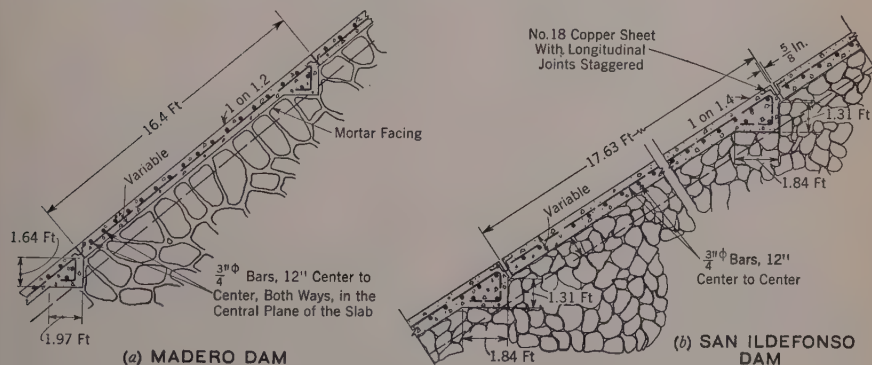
TYPICAL SECTIONS OF CONCRETE FACING
